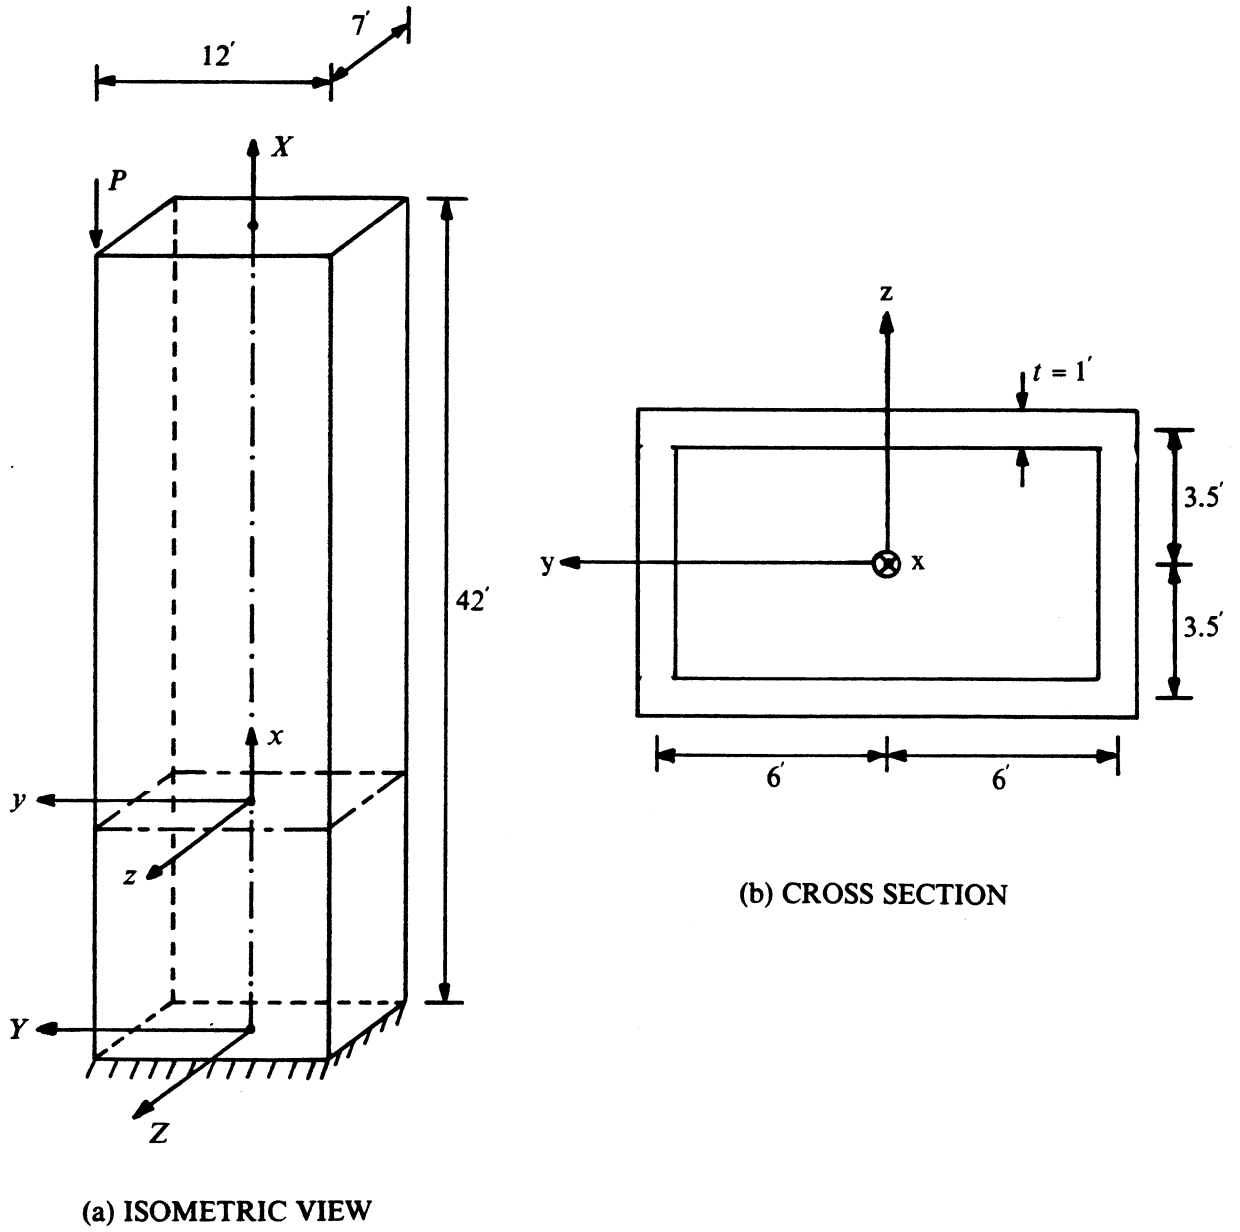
EXAMPLE 8.1 - HOLLOW REINFORCED CONCRETE COLUMN
